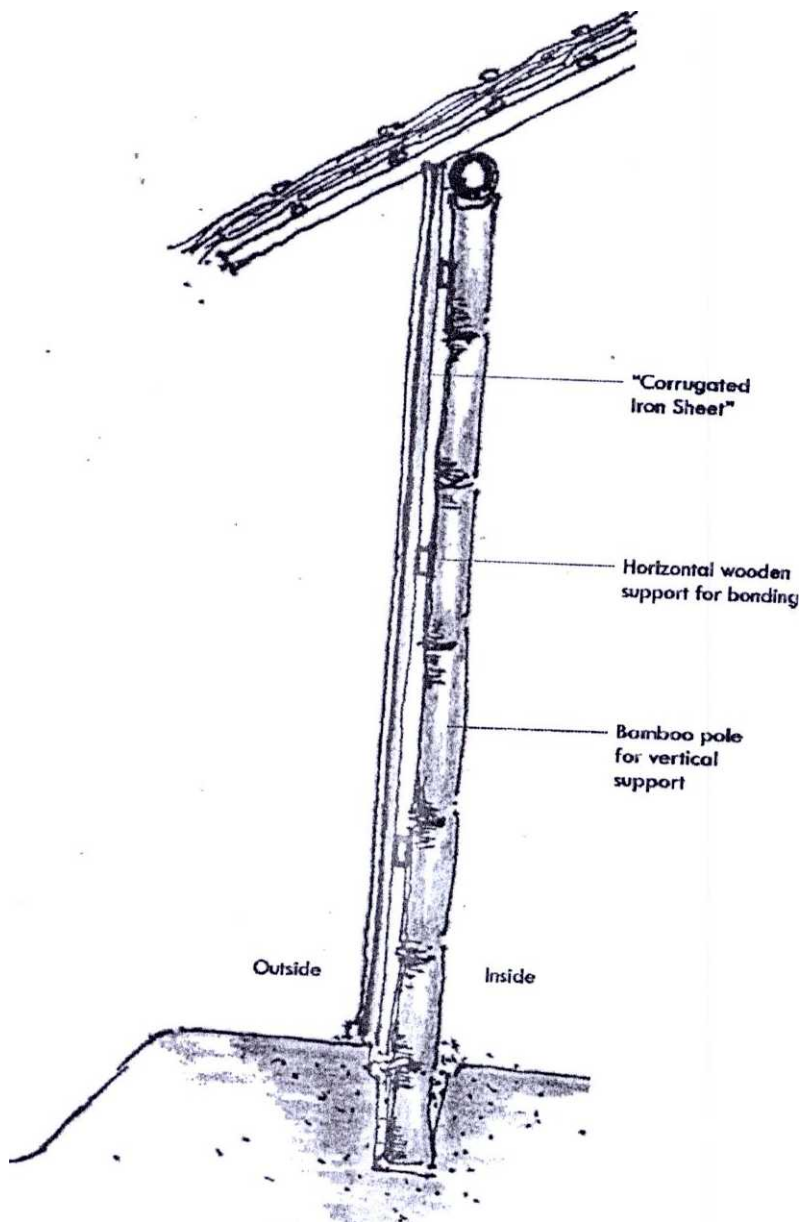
Wall made of 'Corrugated Iron' (CI) Sheet
